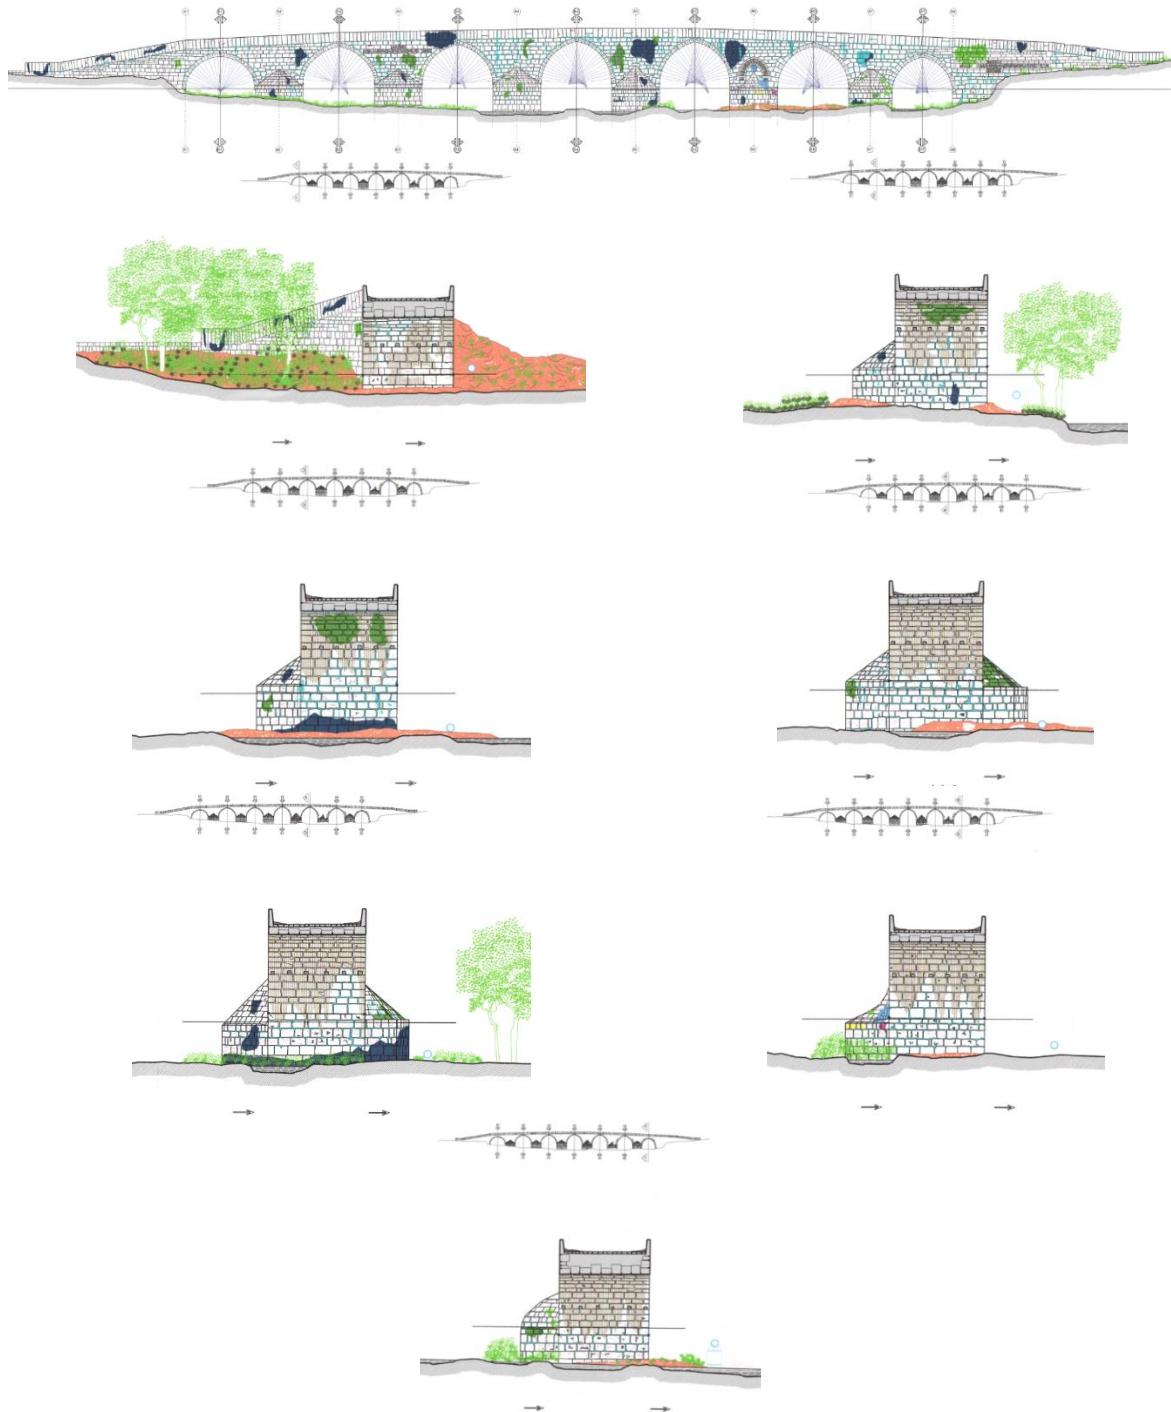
Halilviran Bridge: Section and elevation views with indication of the main geometrical dimensions (Azar and Sari, 2023)
